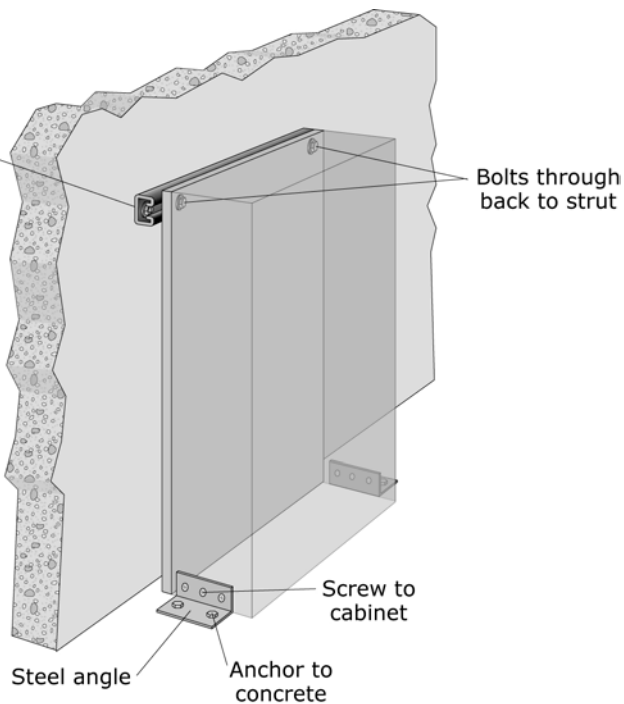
Detail of cabinet base anchorage (Photo courtesy of Maryann Phipps, Estructure).
